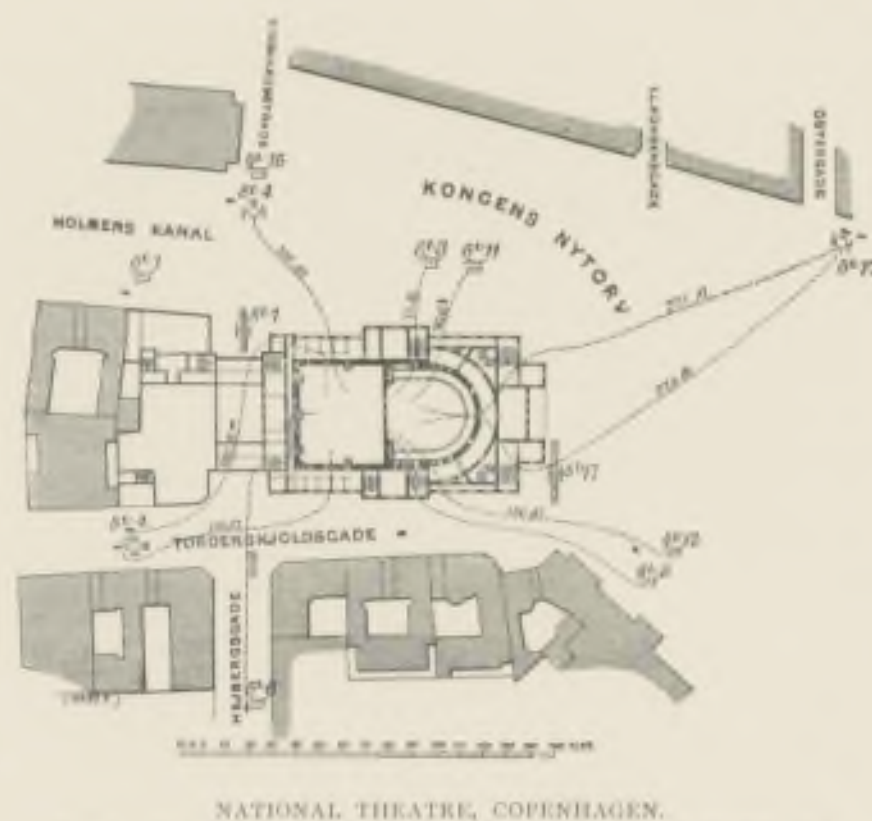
PLAN OF FIRE BRIGADE ARRANGEMENTS IN EVENT OF AN OUTBREAK.
